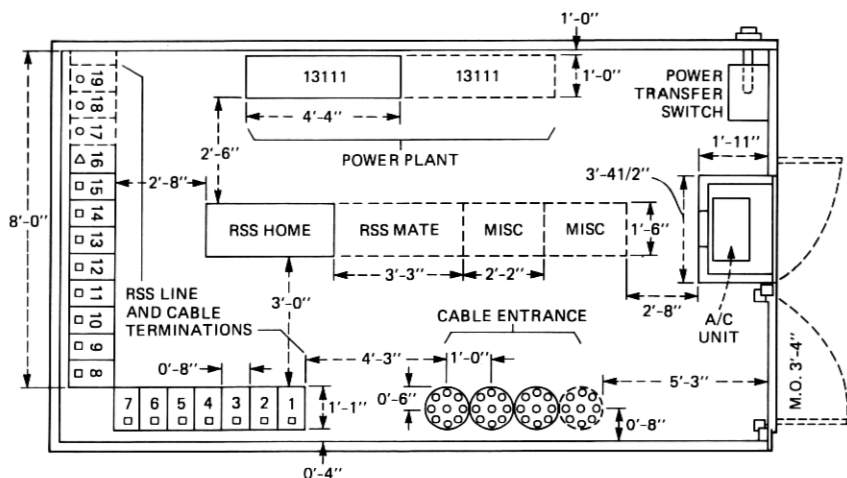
Remote Switching System floor plan (electronic equipment enclosure).
